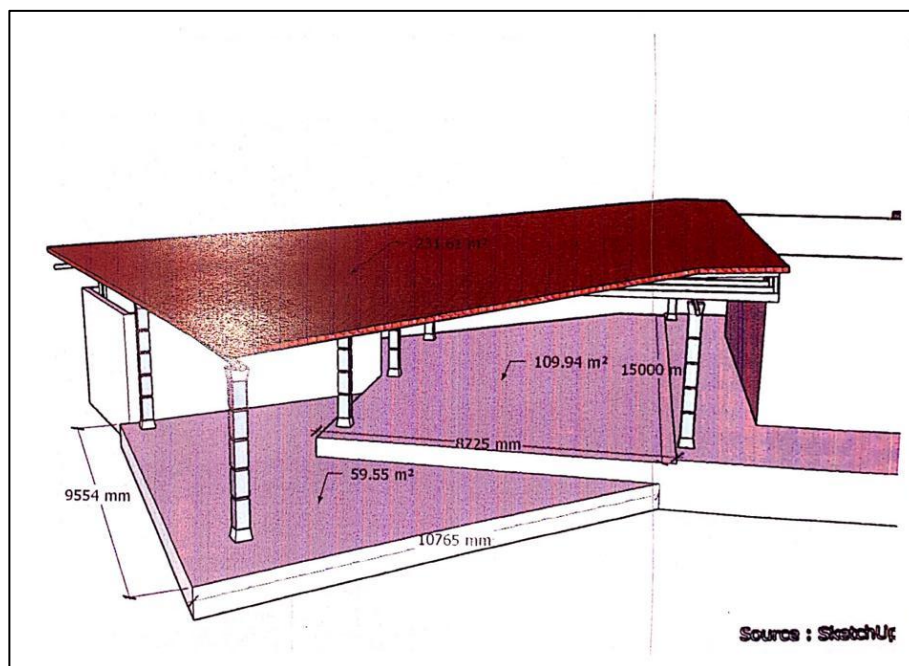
plan to do setting out ,Kuala Lipis, Pahang
